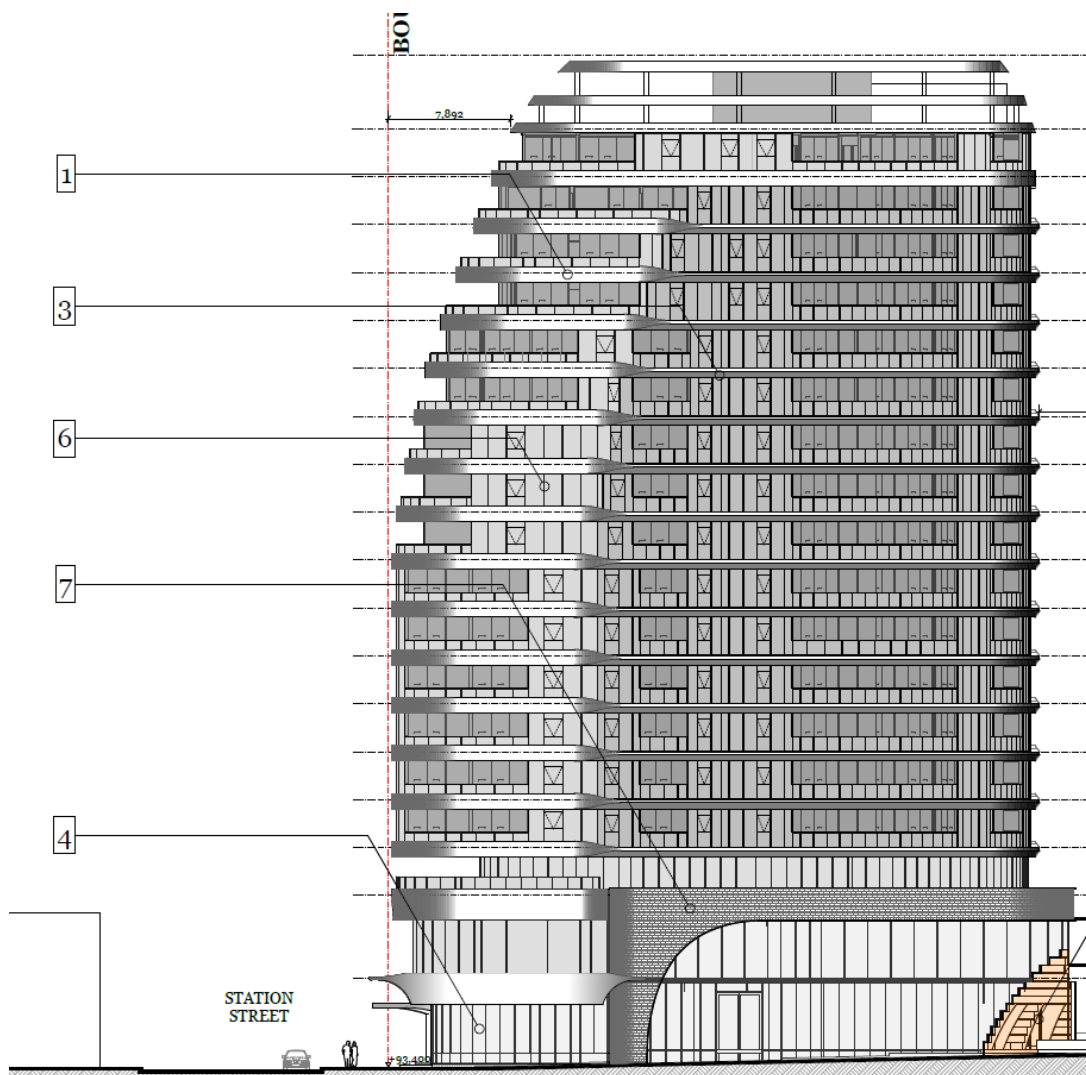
Showing that the finished floor level of ground level tenancy is higher than the footpath level on Cambridge Street
